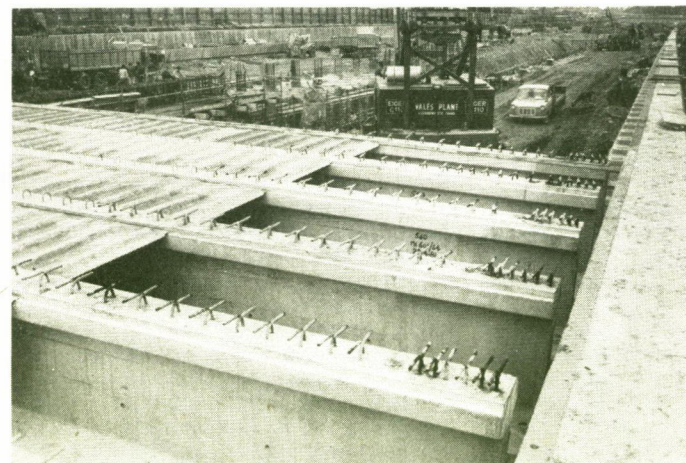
Corrugated glass reinforced cement sheeting infill between beams supplied by Thyssen (GB) Ltd.
